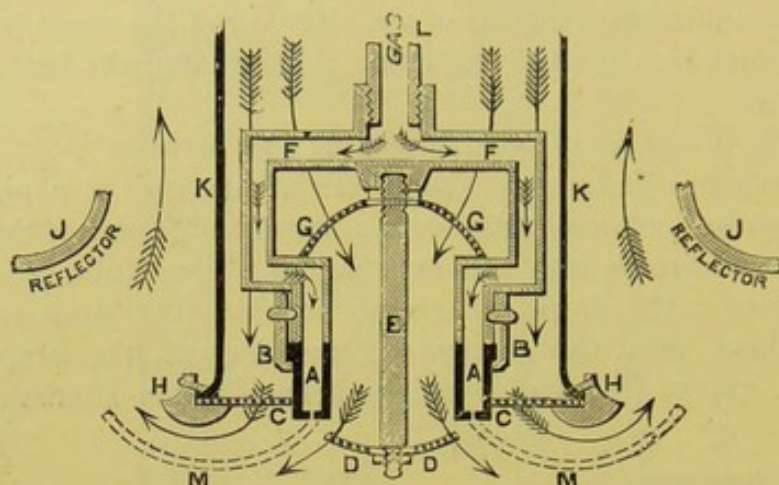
SECTION OF A WENHAM'S VENTILATING GAS-LAMP.
